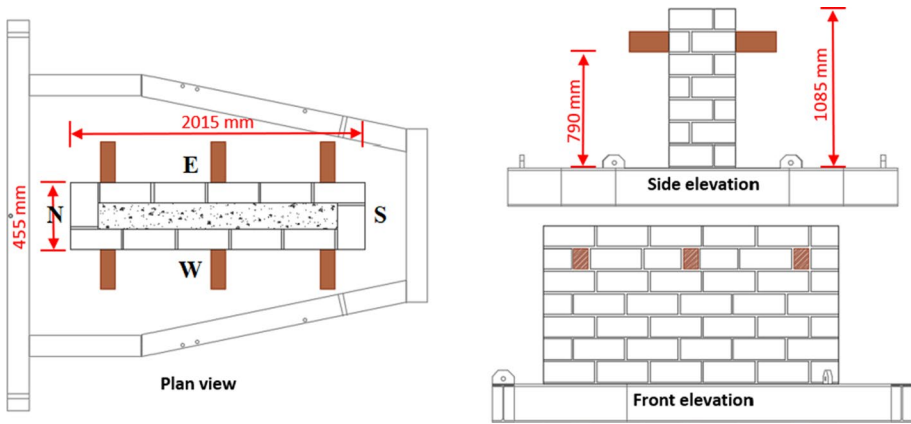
Wall specimen: plan view, side elevation and end elevation. W (West), E (East), N (North), S (South) in the plan view indicate the four lateral leaves
